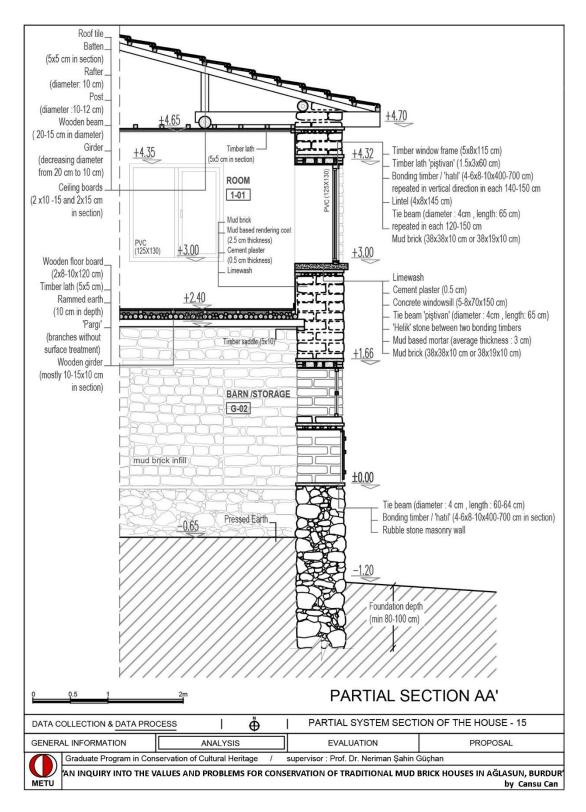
Partial Section AA' from the House-15 showing the Structural System
